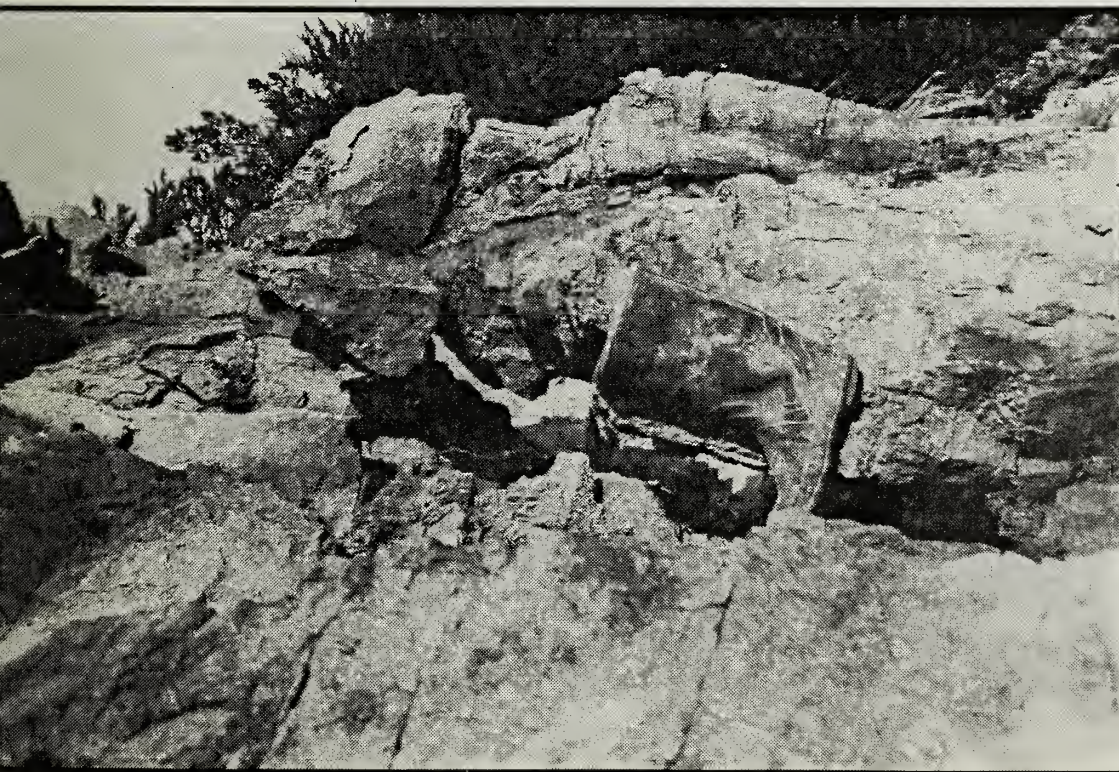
PHOTOGRAPH -- SITE SLOPE STABILIZATION AREAS
